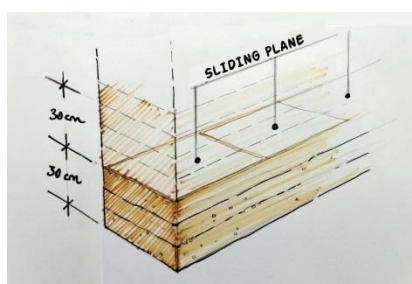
General View of an Adobe Wall with Sliding Planes, Drawing : E. Nurcin Kara
